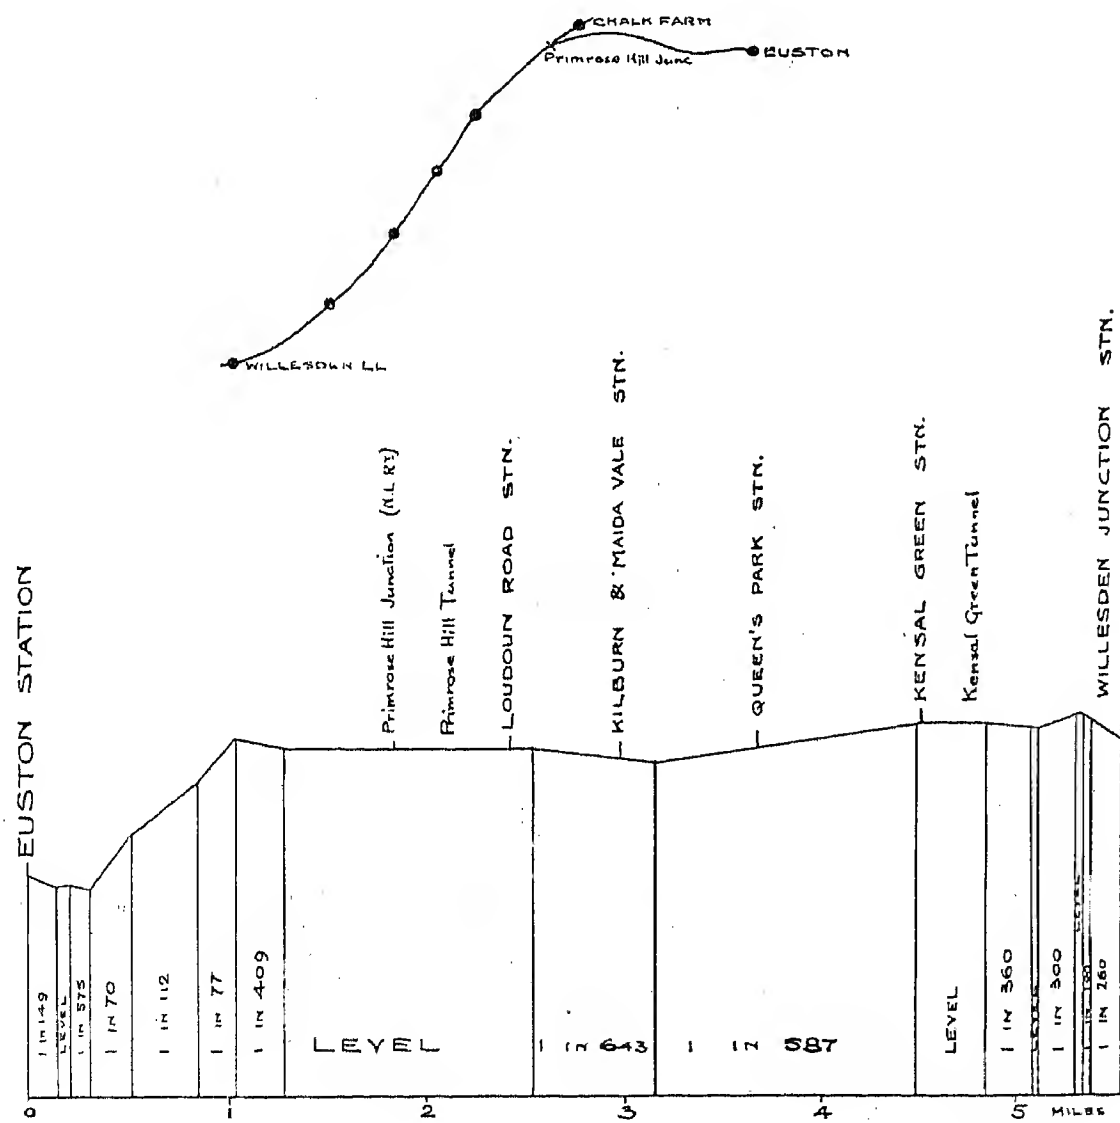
Profile of section Euston Station—Willesden Junction, with plan.
